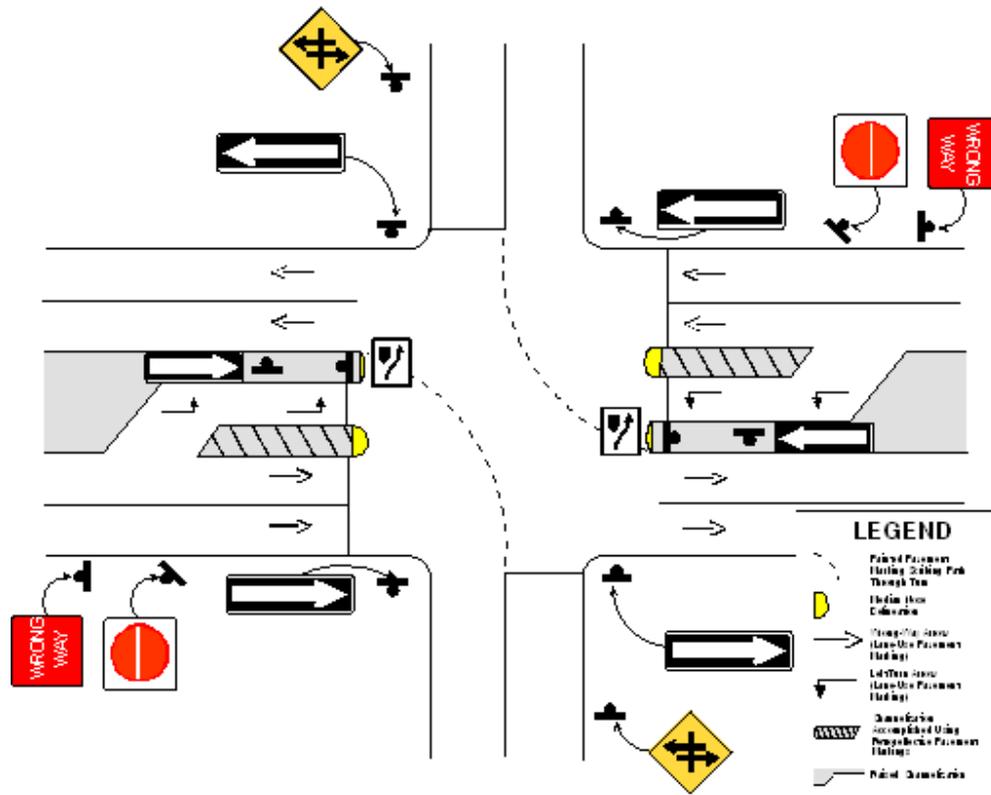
TURNING LANE PAVEMENT ARROWS
